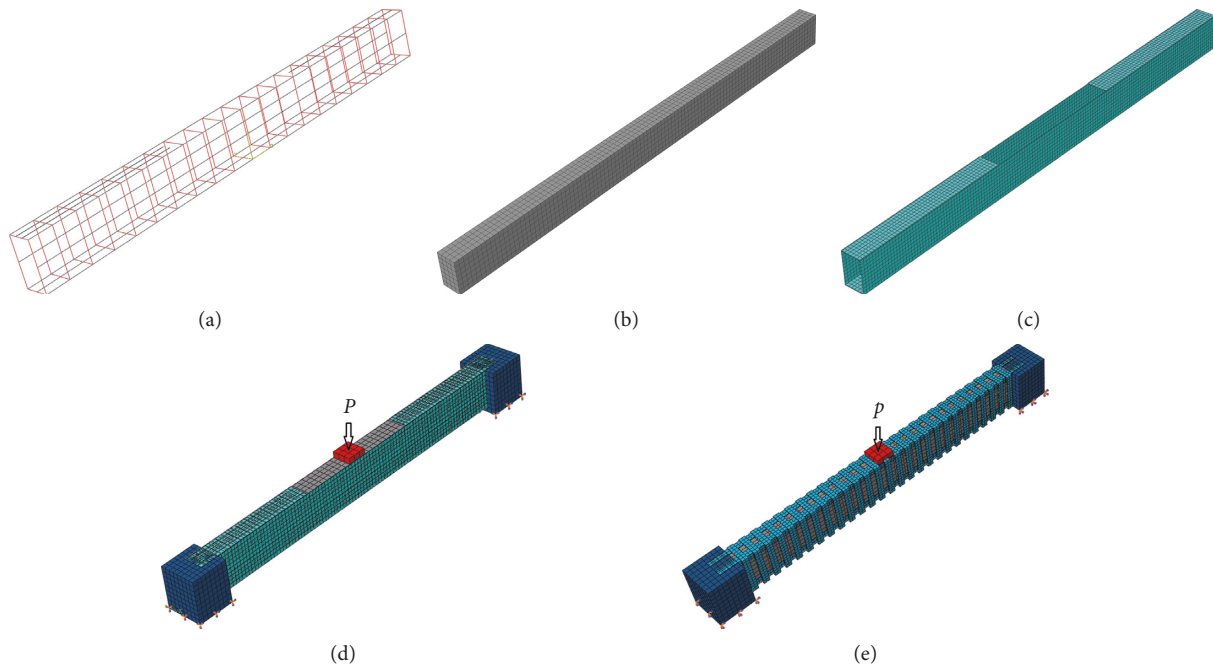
Finite element model of (a) reinforcement skeleton, (b) concrete, (c) steel plate for strengthening, (d) reinforced frame beam, and (e) reinforced RC beam for contrast.
